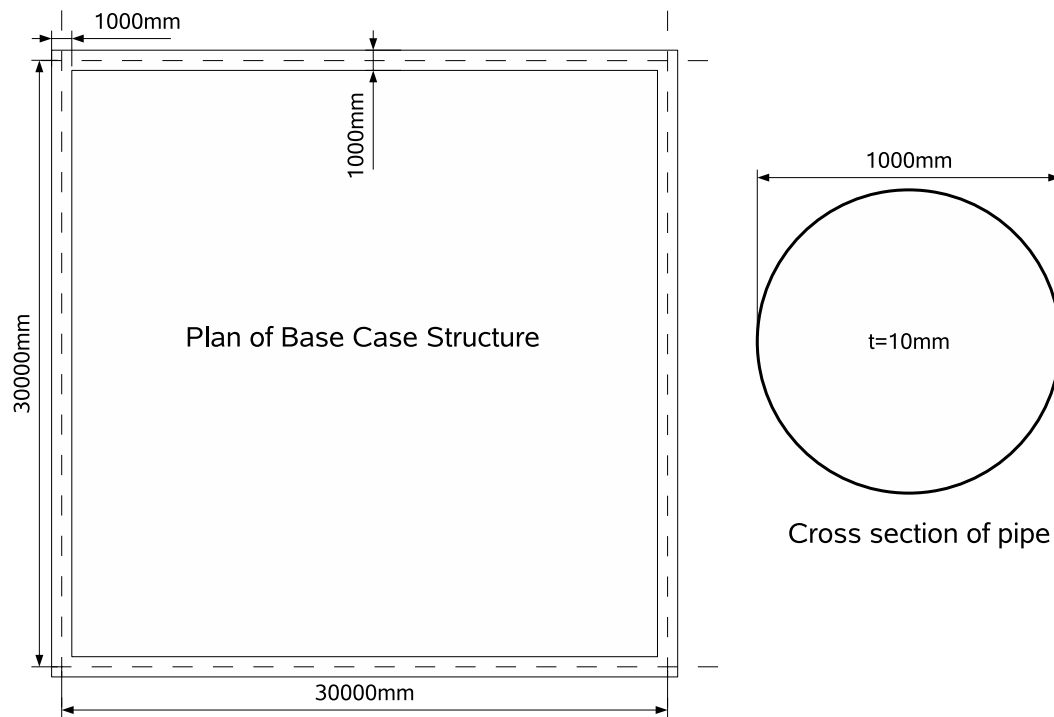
Plan of Base Case Structure and cross section of pipe.
